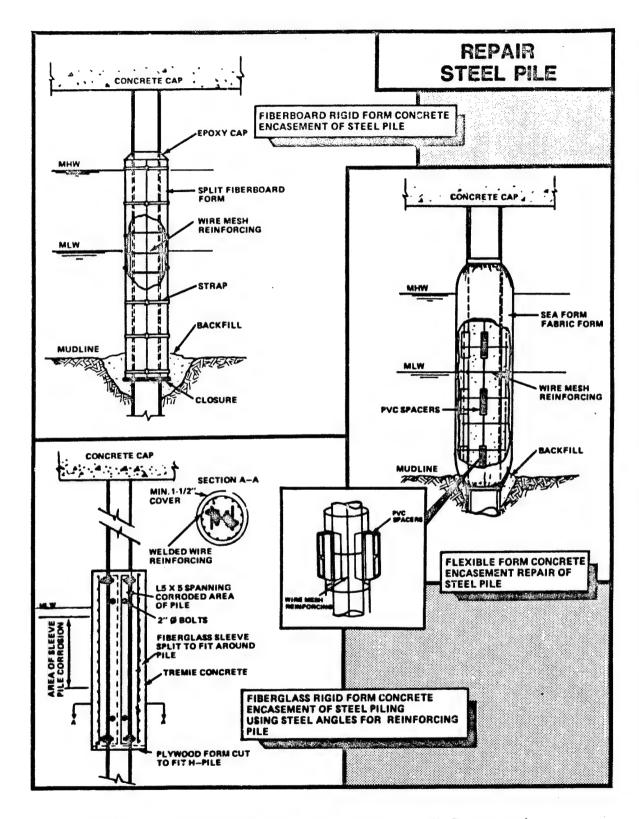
Repairing Steel Pile Using Concrete Encasement.
